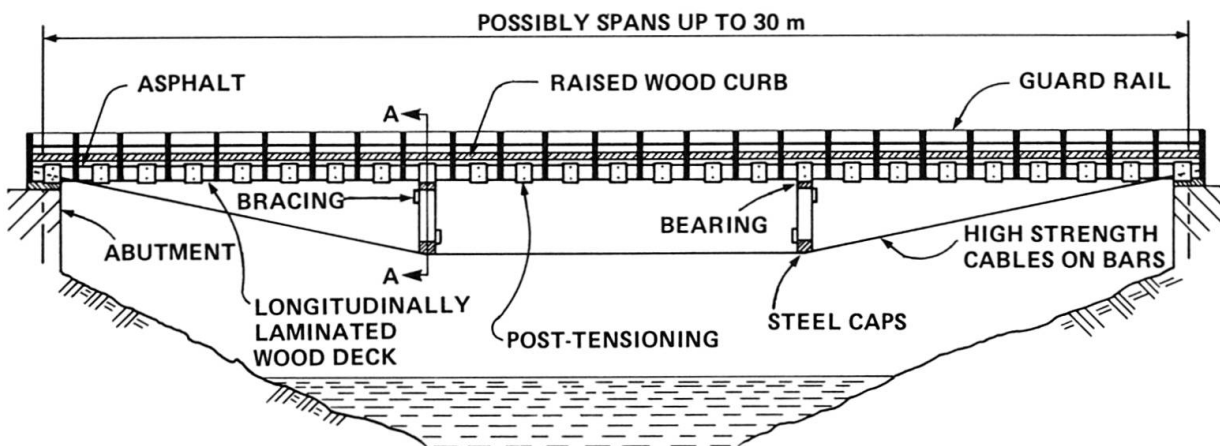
Long-Span, Transverse Post-Tensioned Deck System Using Tie-Bars
